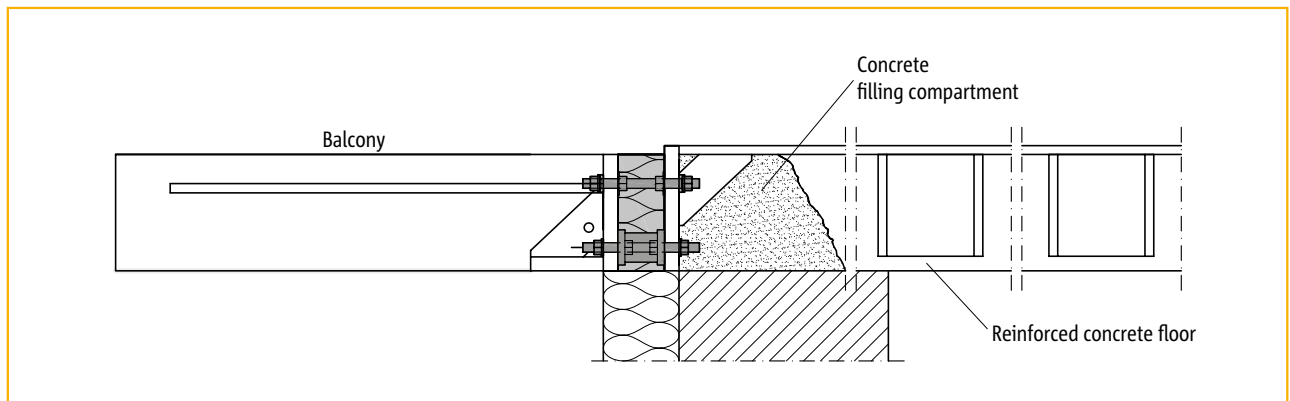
Balcony freely cantilevered, connected with type KST (in-situ concrete)
